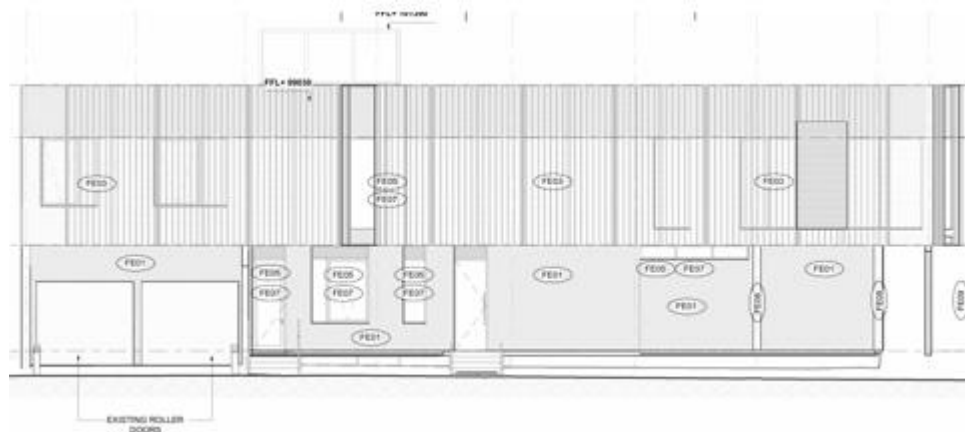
South elevation (view from Menara Road) (Source: Application)
